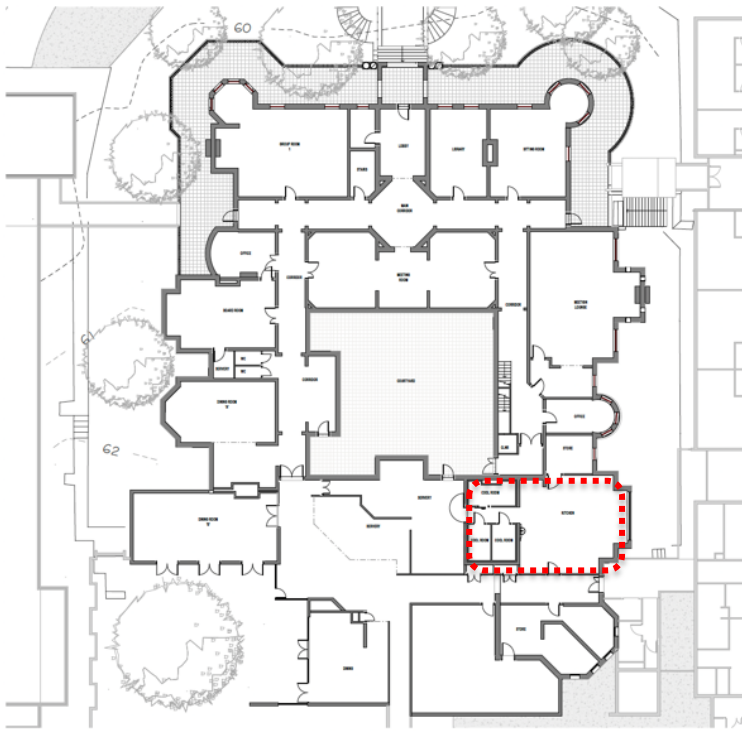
EXISTING GROUND FLOOR PLAN. Kitchen area outlined in red.
